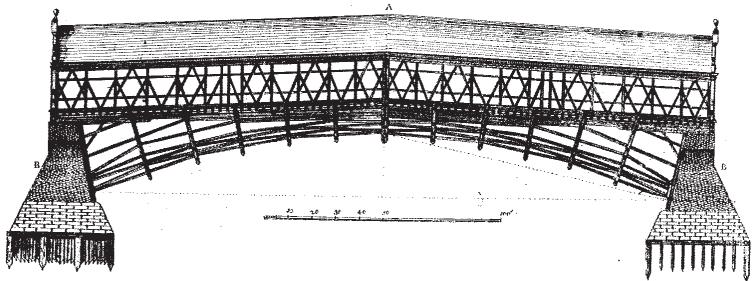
Arch-truss bridge with a wooden polygon approximating an arc shape
